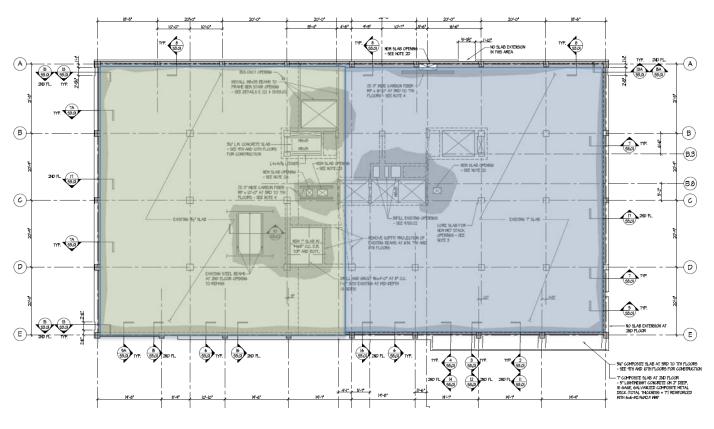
/ Typical floor plan of the building 9 1/2" slab 7" slab
